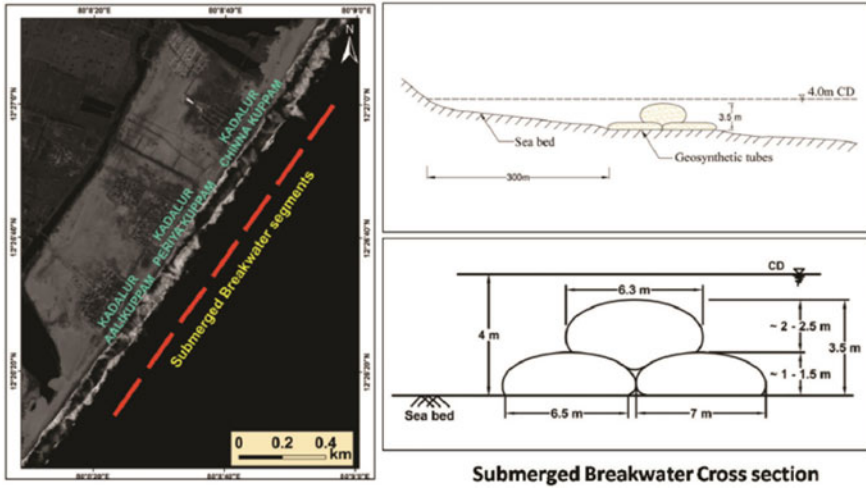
Submerged breakwaters to prevent erosion at Kadalur Periyakuppam. The left panel shows the overall layout. The top right panel shows the cross shore profile, and the bottom right panel shows the typical placement of the geotubes
